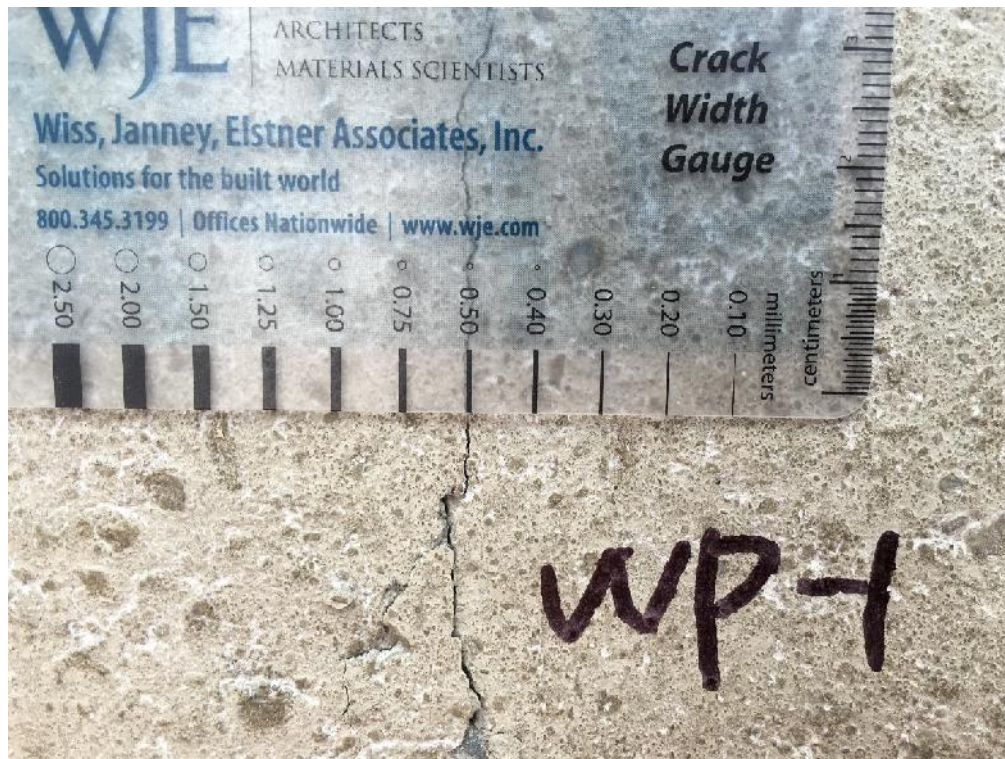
Plain wet-mix shotcrete panel #1, 0 kg/m³ fiber, crack width of 0.5 mm
